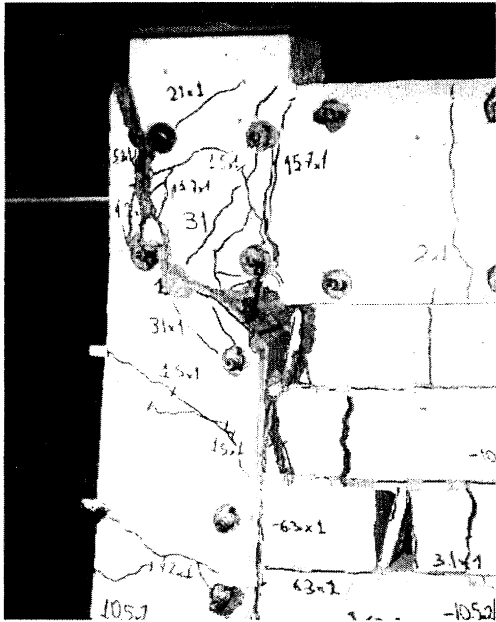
Detail of the south beam-column joint of Unit I after the test.
